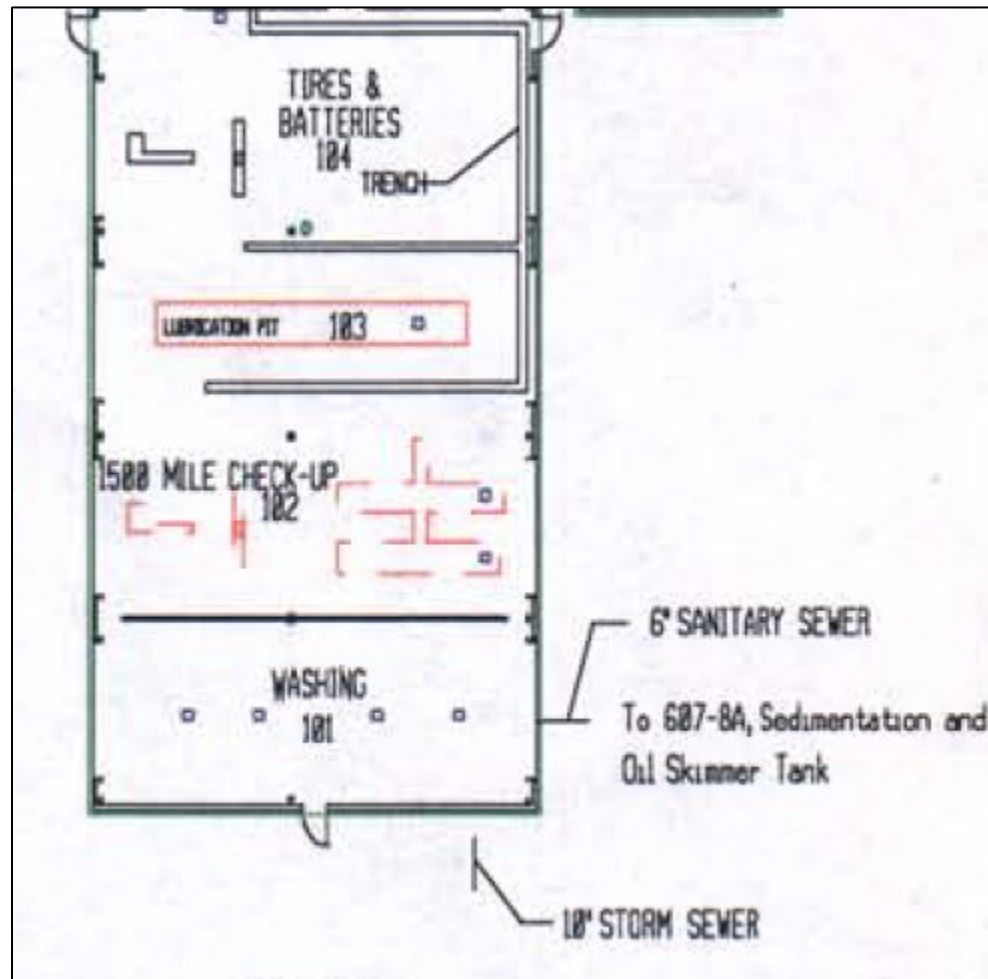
Location of 103 Lubrication Pit within the South End Floor Plan of Building 716-A
